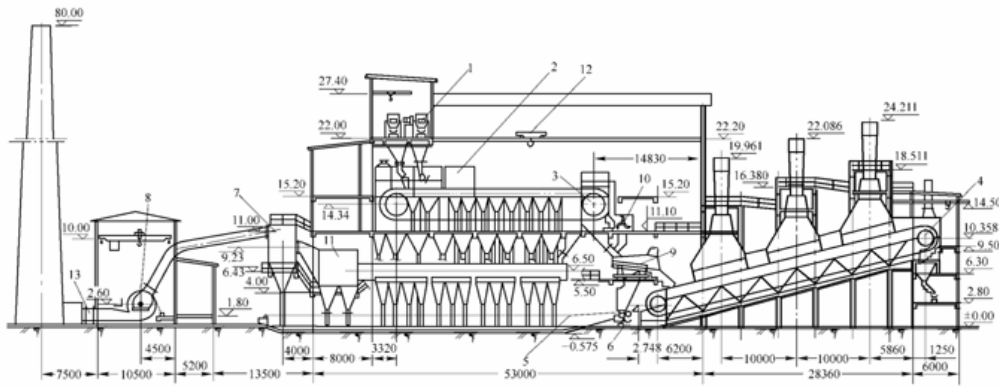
Schematic view of a 24m² sinter machine and sinter cooler
